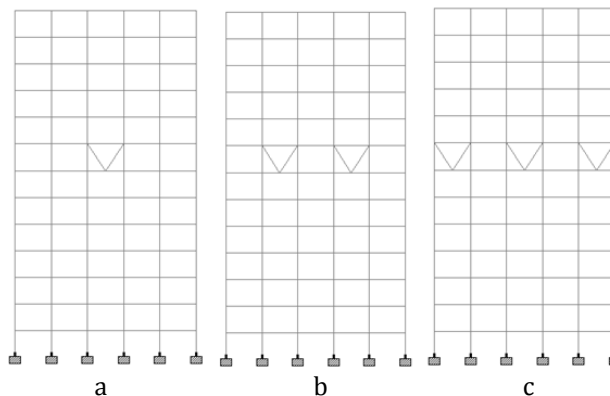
Optimum bracing pattern for 5-bay 12 storey structures, sixth floor level braced.
